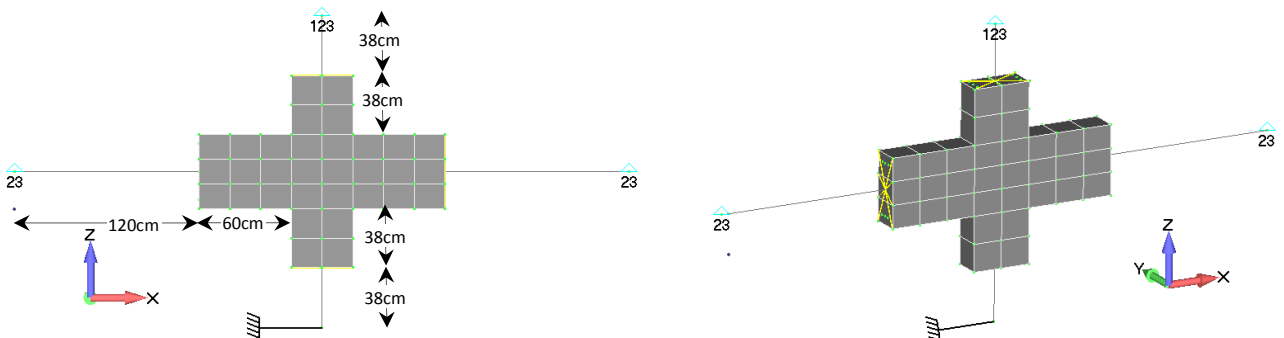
2D and 3D views of the FE mesh of concrete elements and steel reinforcement embedded rebars.
